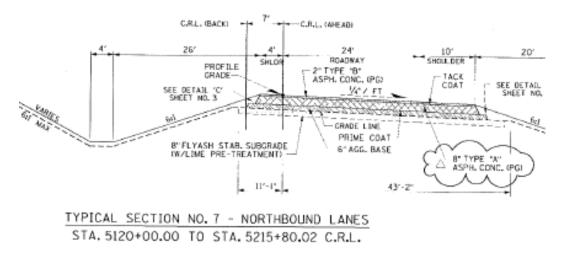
Typical cross section SH 99 Seminole County, Oklahoma
